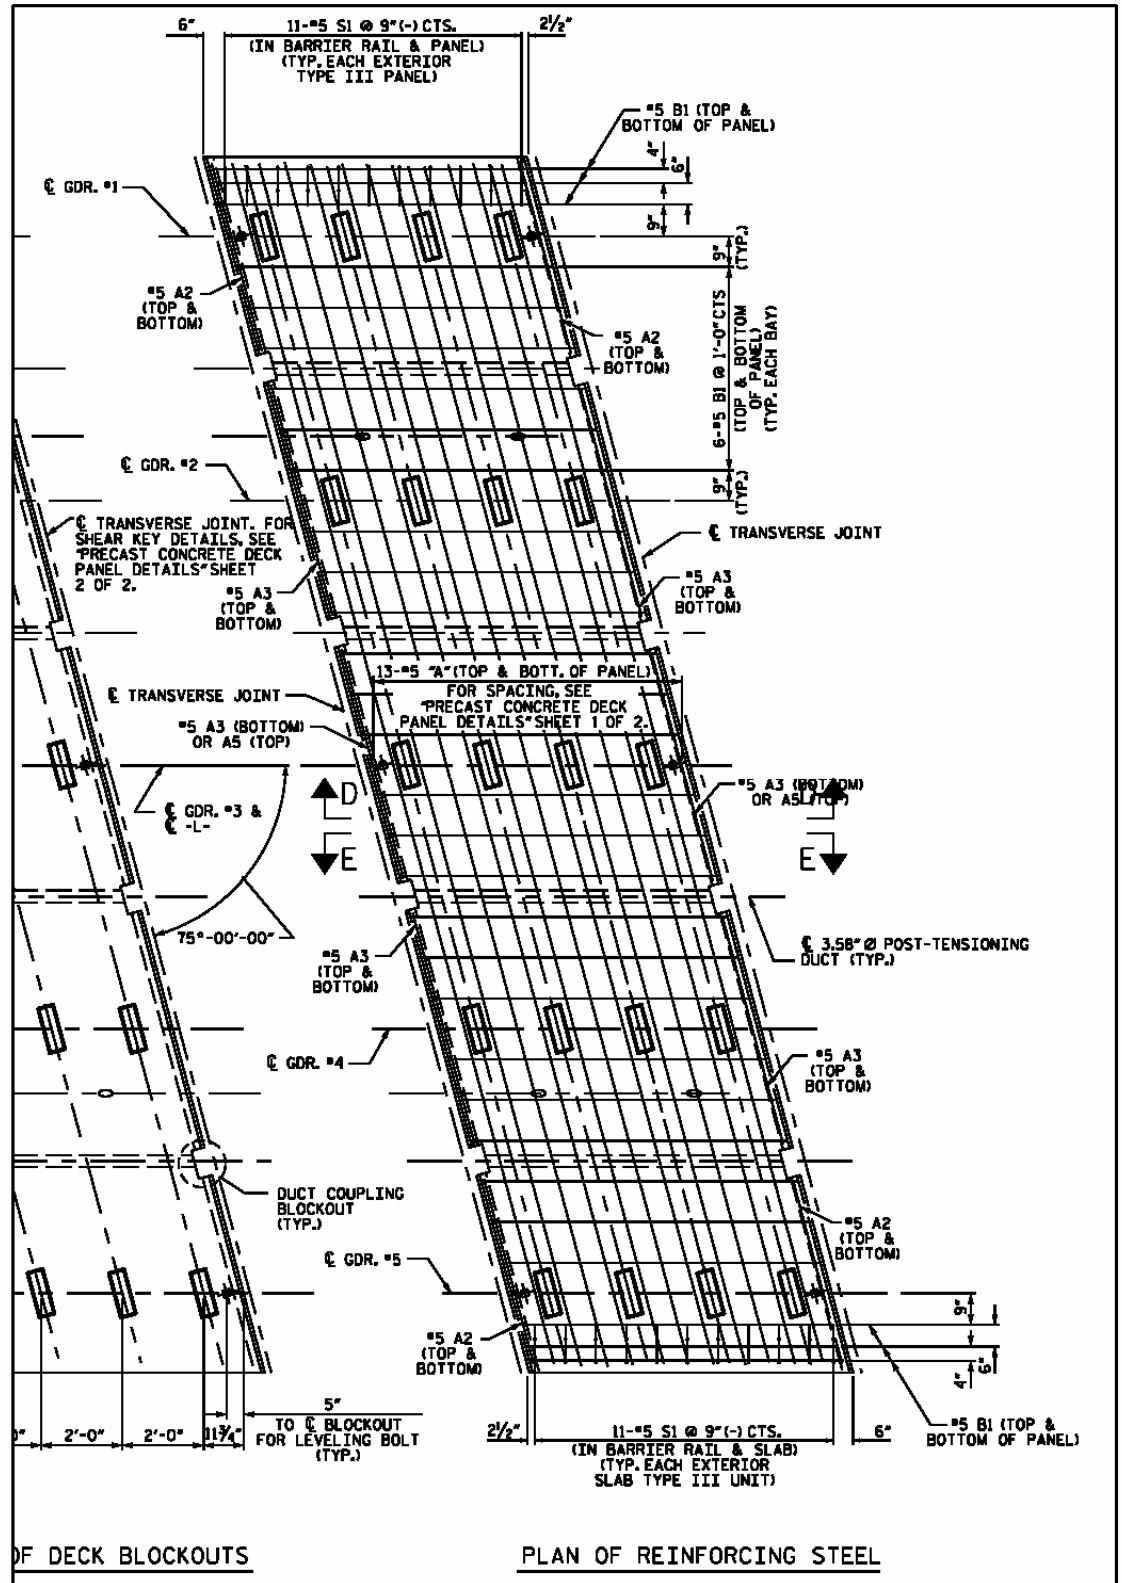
Panel Reinforcing and Post-Tensioning duct layout
